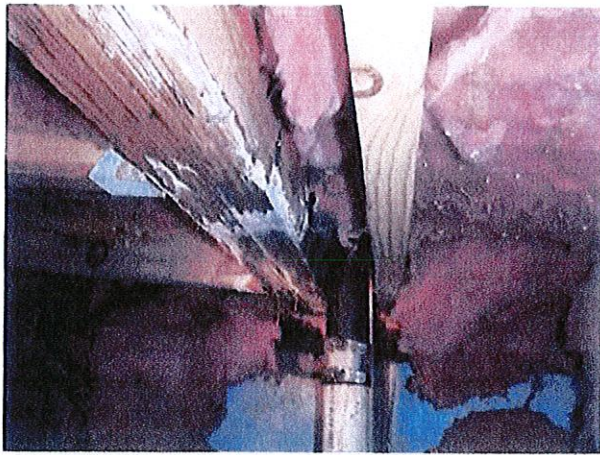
Deteriorating sill plates in 300 building crawl (photo courtesy of REG)
